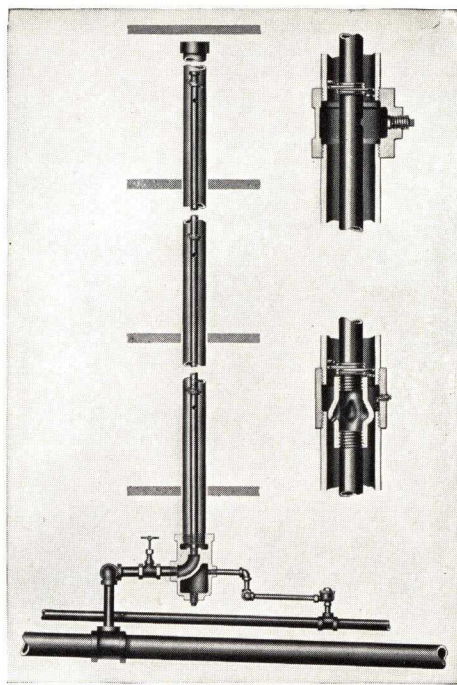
Webster Inner-Tube Heating Risers (Patented)
